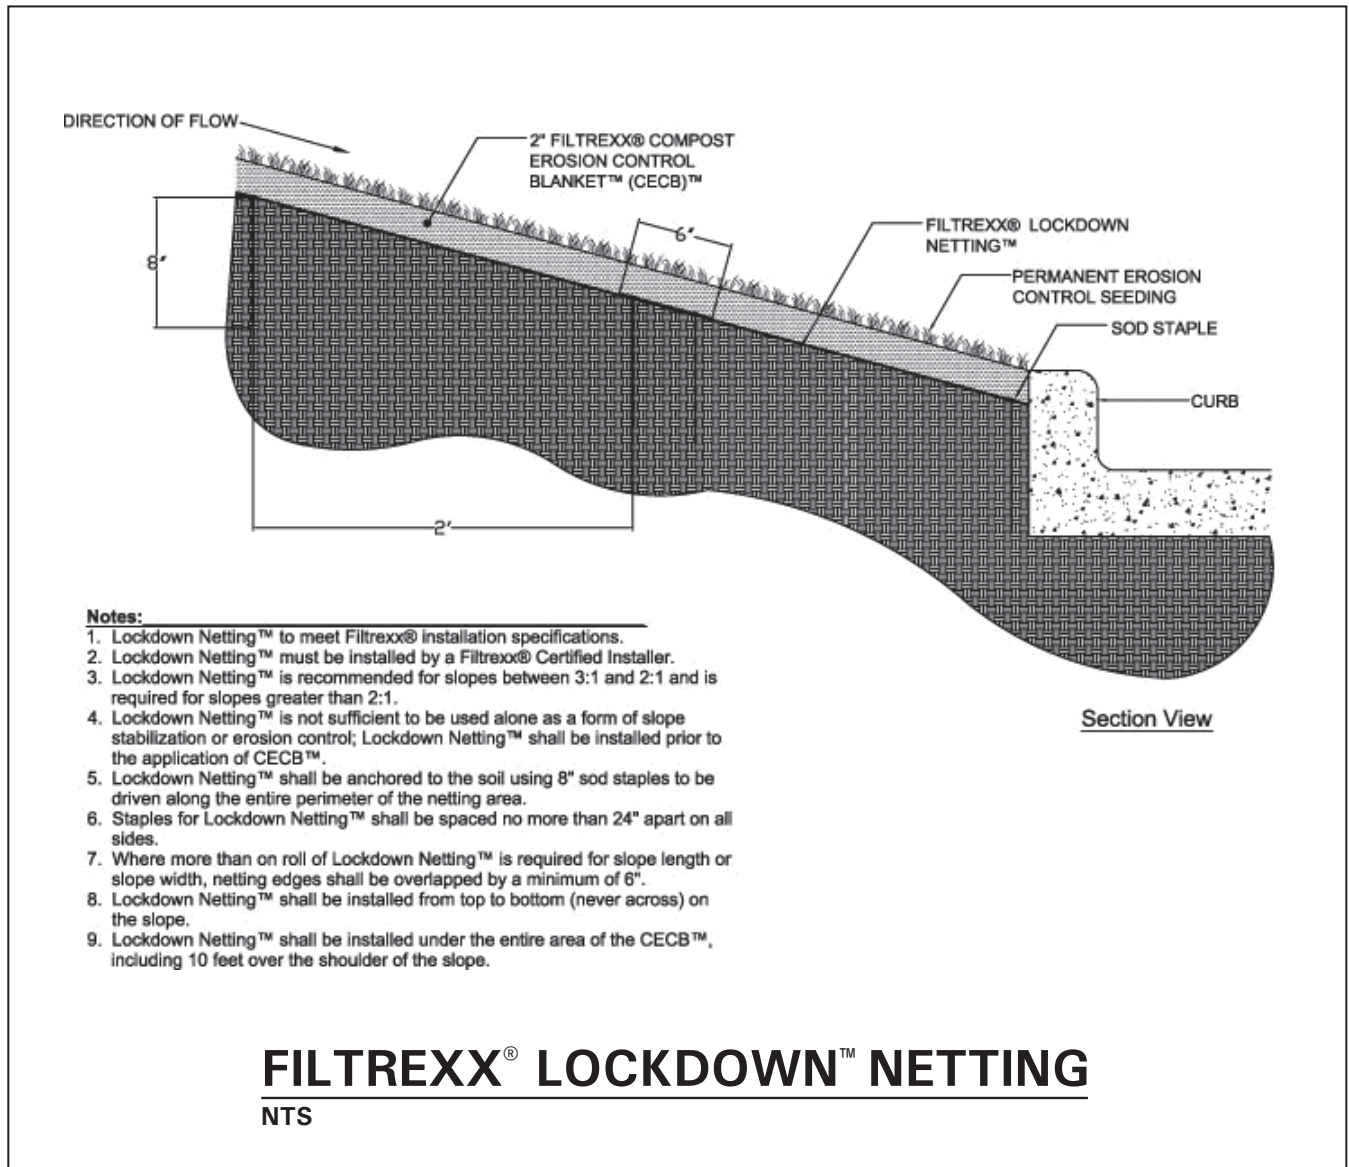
Design Drawing Detail for LockDown™ Netting Installed on Top of Slope Protection.
